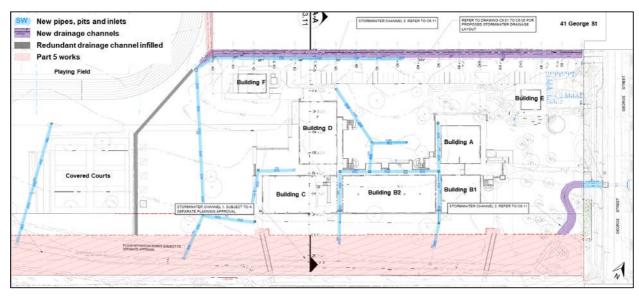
| Proposed on site flood mitigation works and stormwater infrastructure (Base source: Applicant's RtS)
